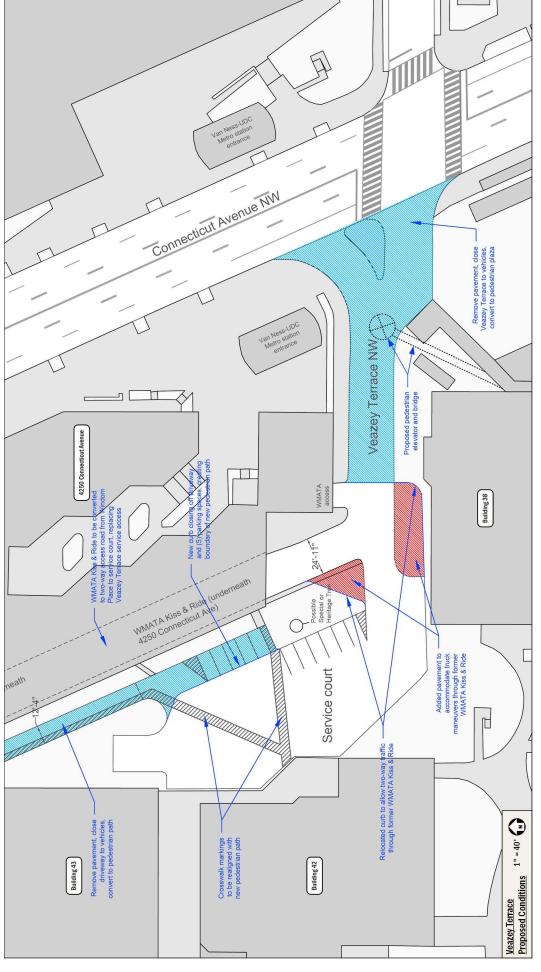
Proposed Roadway Modifications: Veazey Terrace Alternative A
